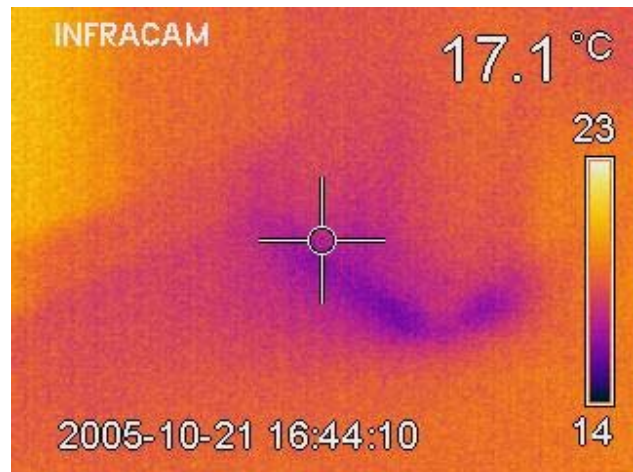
Picture of the wall and floor in CO₂ neutral roof top apartment used for retrofit of old housing blocks.
